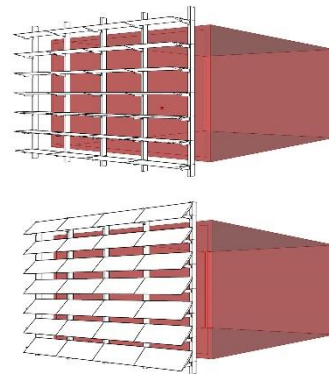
3D model of the system: horizontal louvres made of perforated aluminium sheet, fixed to the structural steel bracket and hooked to a pivot that allow the rotation.
